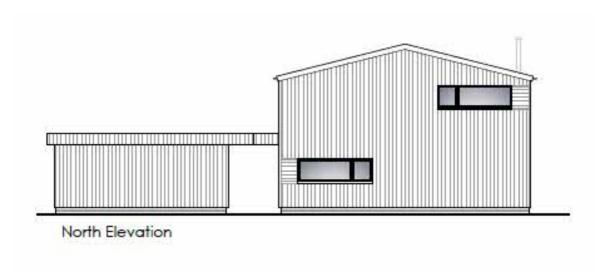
Excerpt from currently Proposed Planning Drawing Plans and Elevations, drawing number 21440, 02 G, by Vertex Architecture
